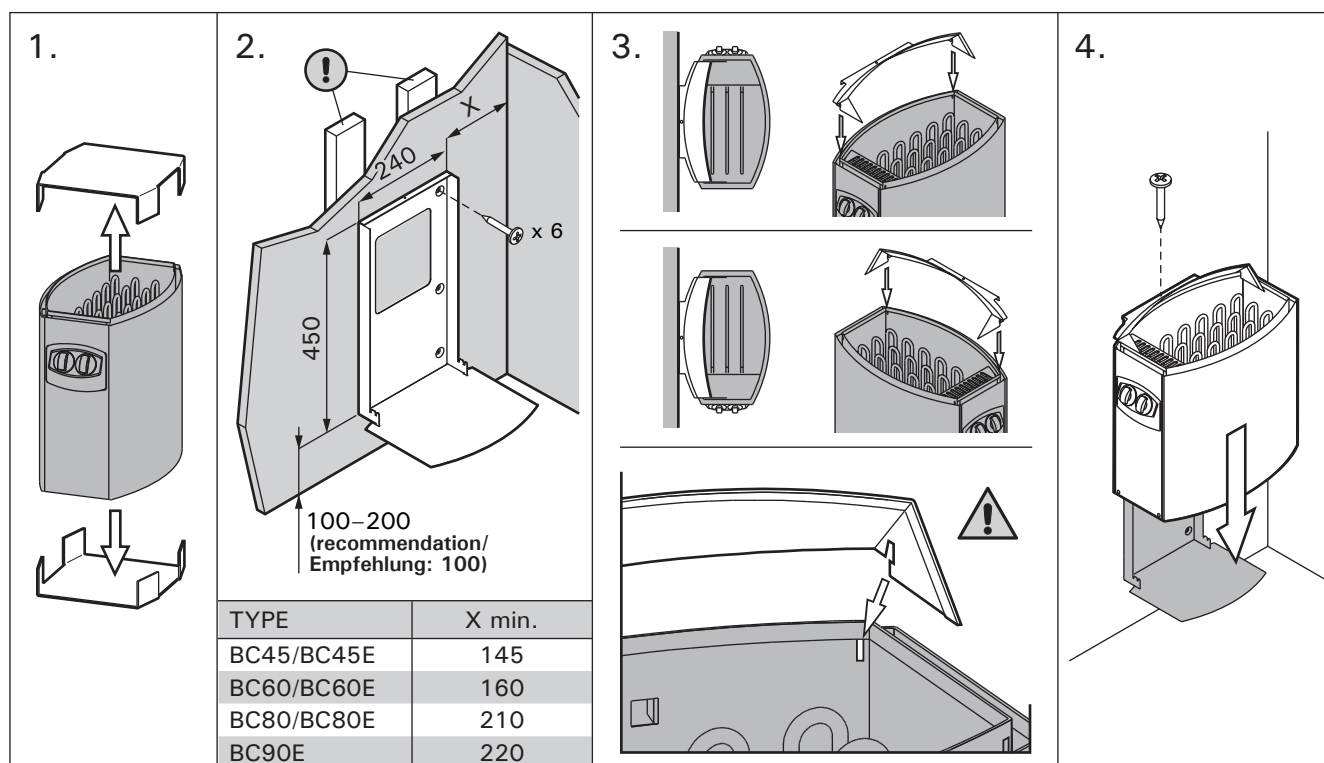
Fastening the heater on a wall (all dimensions in millimeters)
